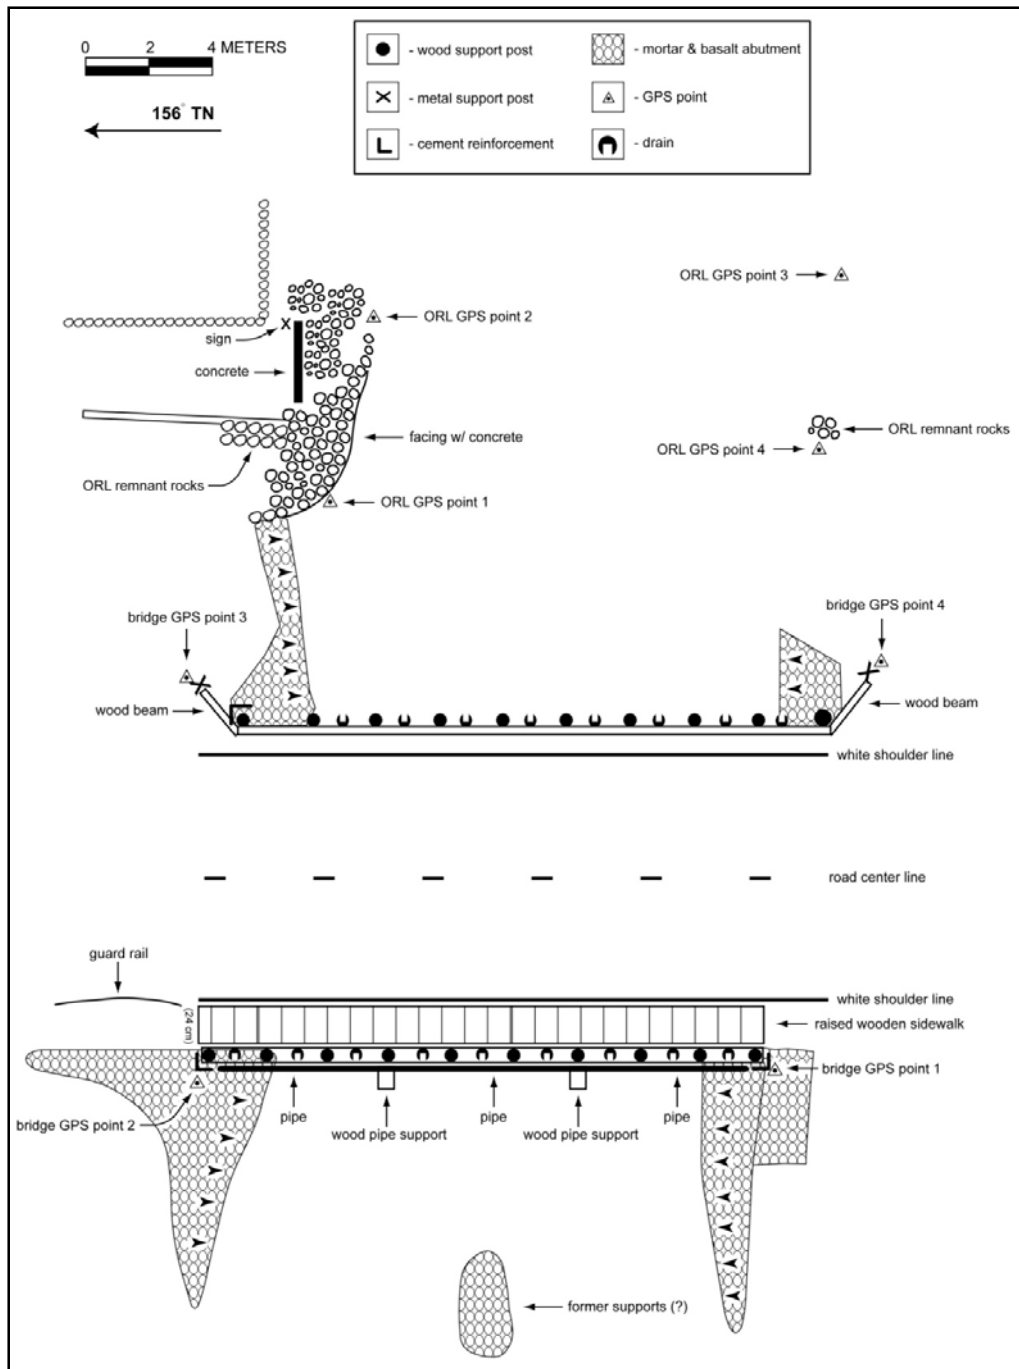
Plan view of SIHP # 50-80-07-6822 (Bridge 3) and Feature B of SIHP # 50-80-12-9714, a remnant of the OR&L Railroad trestle
